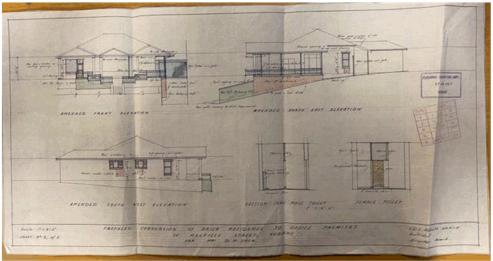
Architectural Plans for 1965: Note extension of the driveway (TAHO: building application record 20133)
